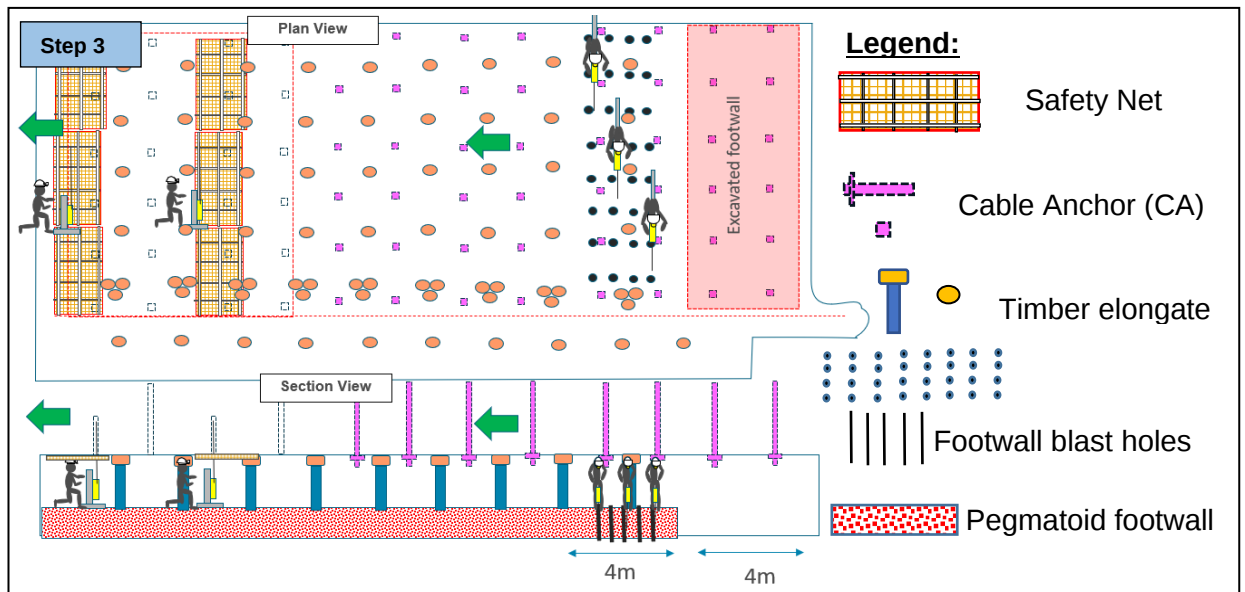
Blasted footwall after cleaning and next portion of cable anchor pre-supporting and footwall drilling (Tati, 2022).
